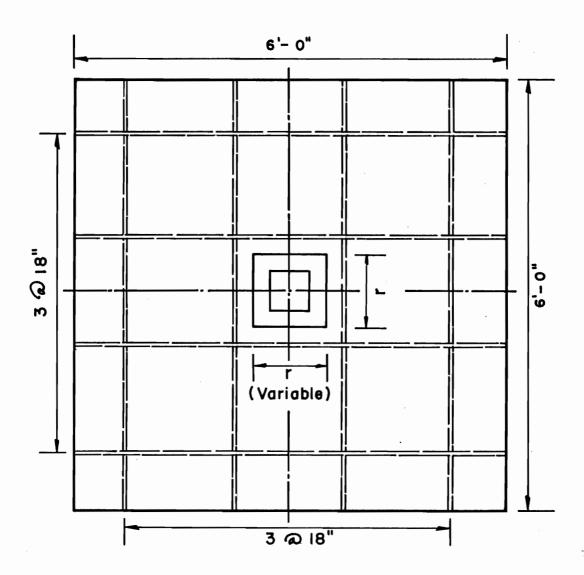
FIG. I LAYOUT OF REINFORCED CONCRETE LIFT SLABS
